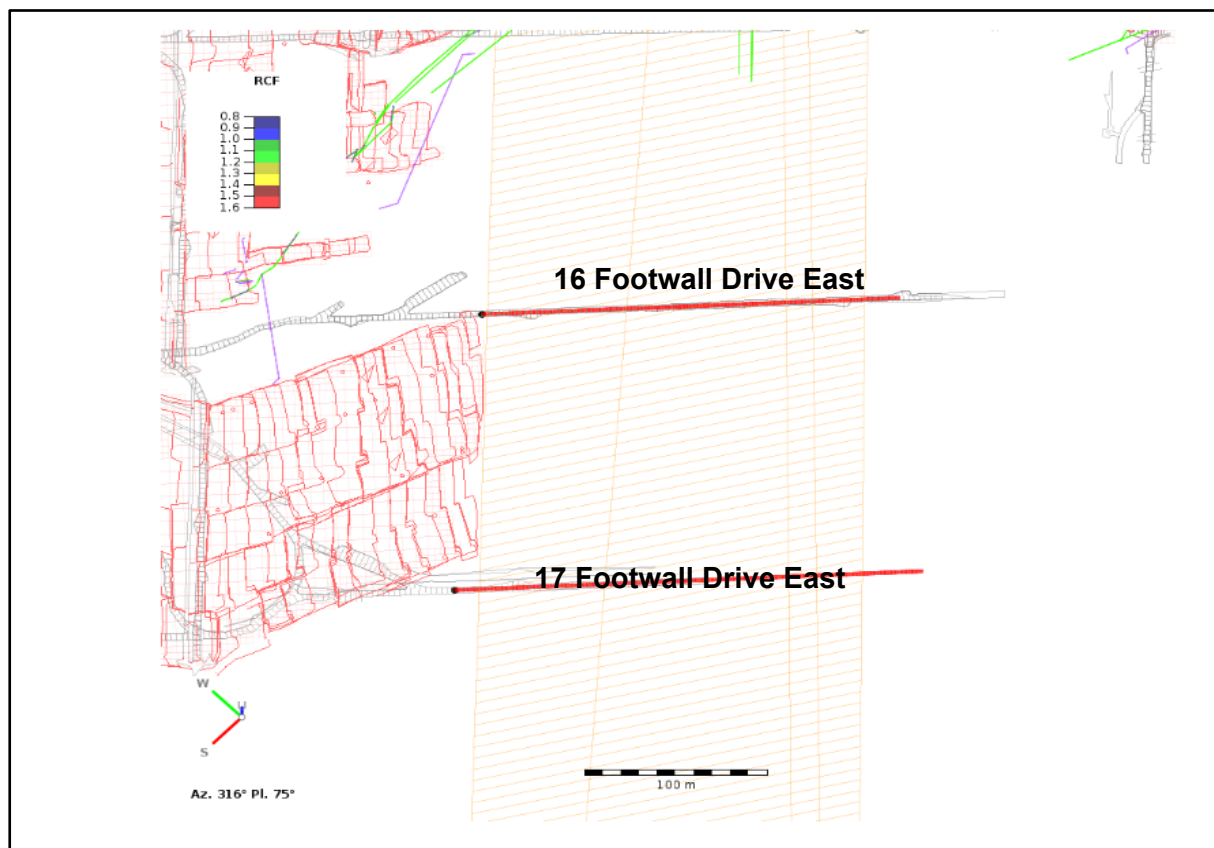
Plan depicting 16 Footwall Drive East and 17 Footwall Drive East
